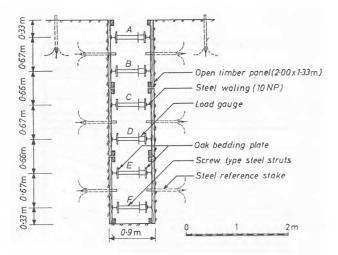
Cross-section of trench Coupe transversale de la tranchée
